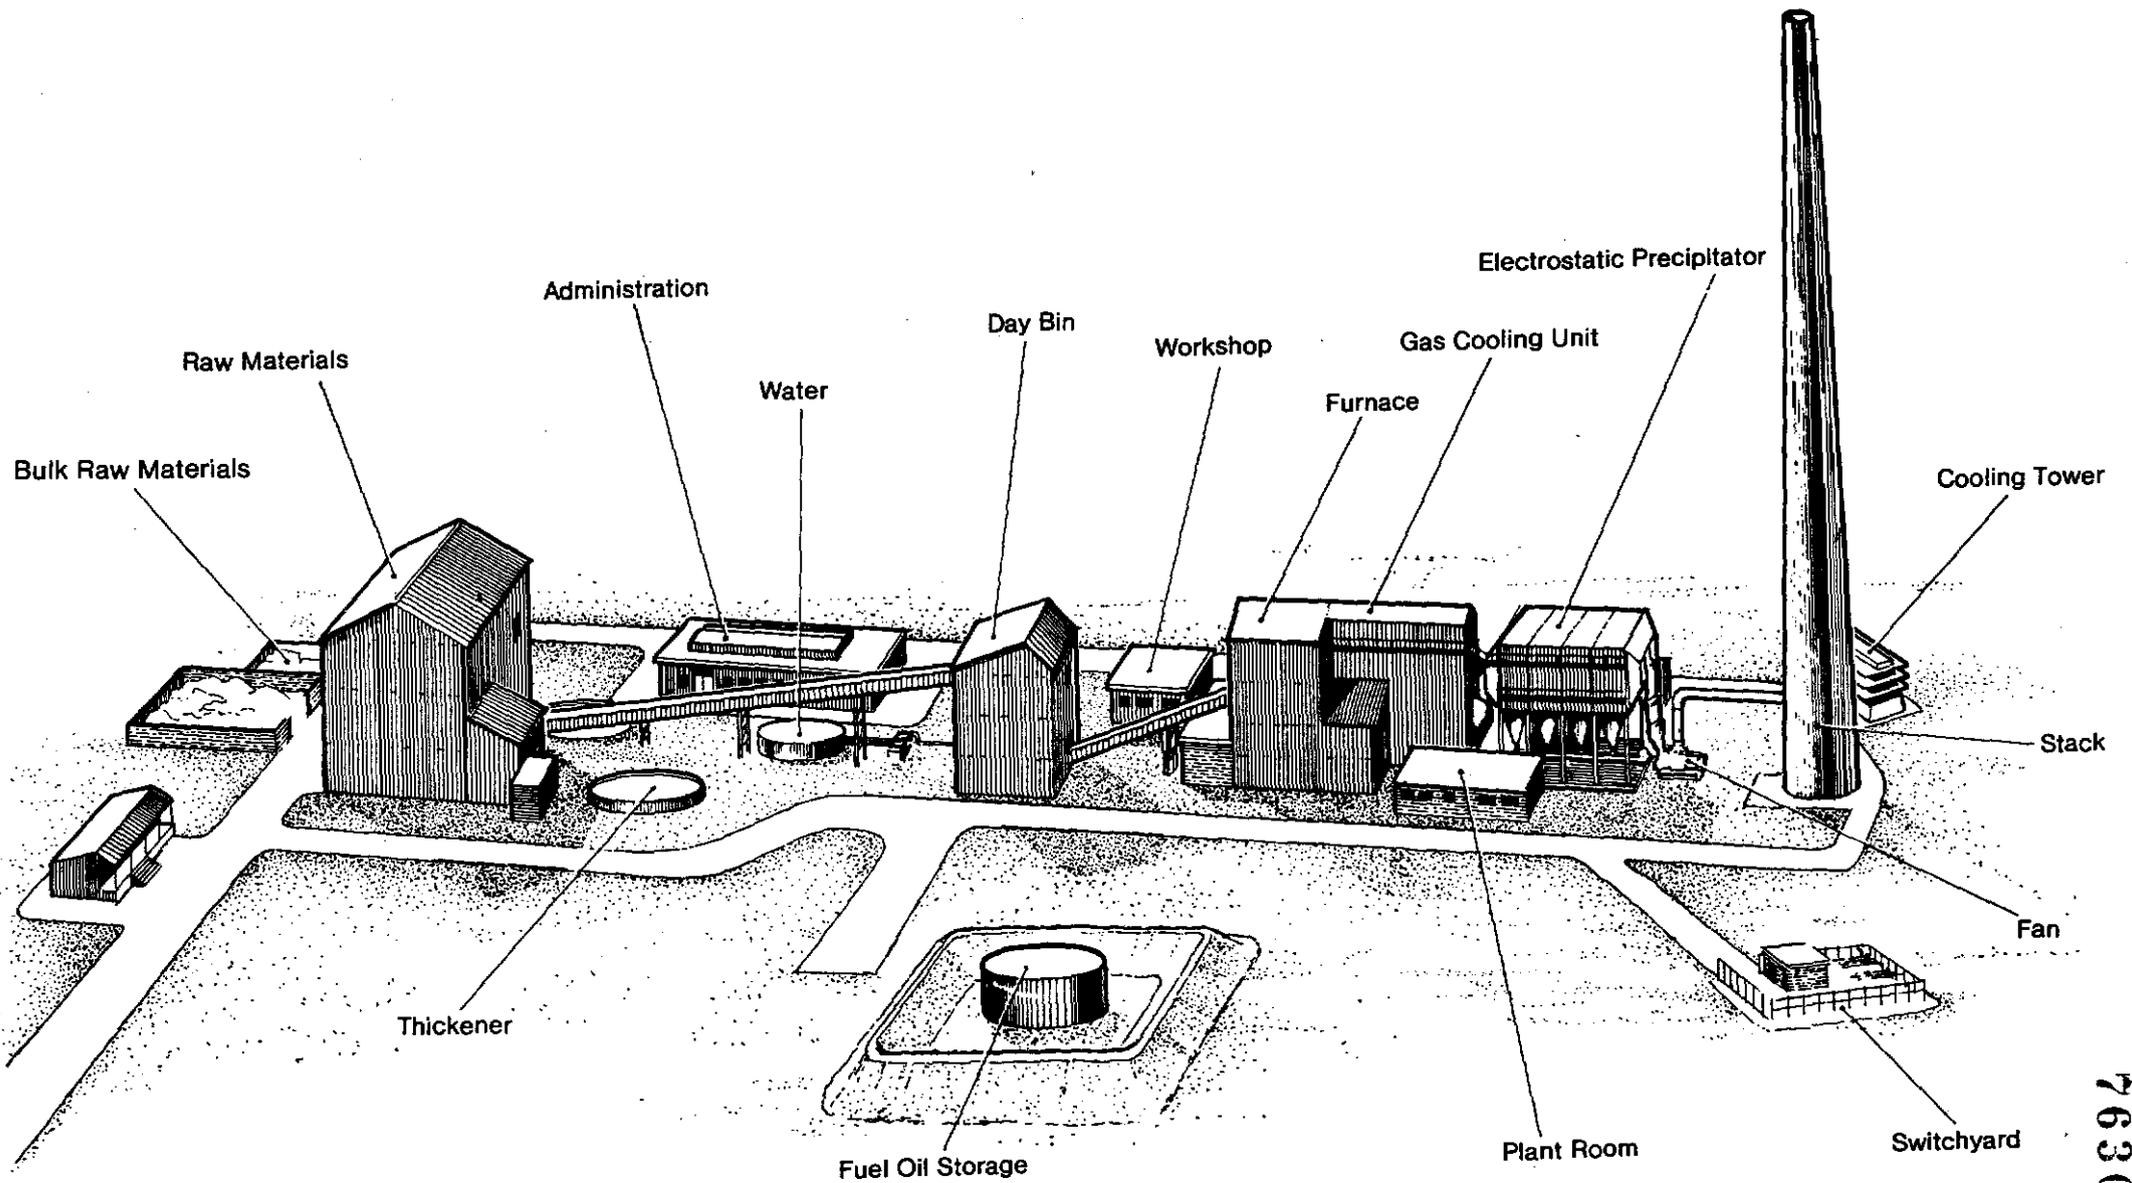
Artists Impression of the Proposed Thermal Upgrading Plant
